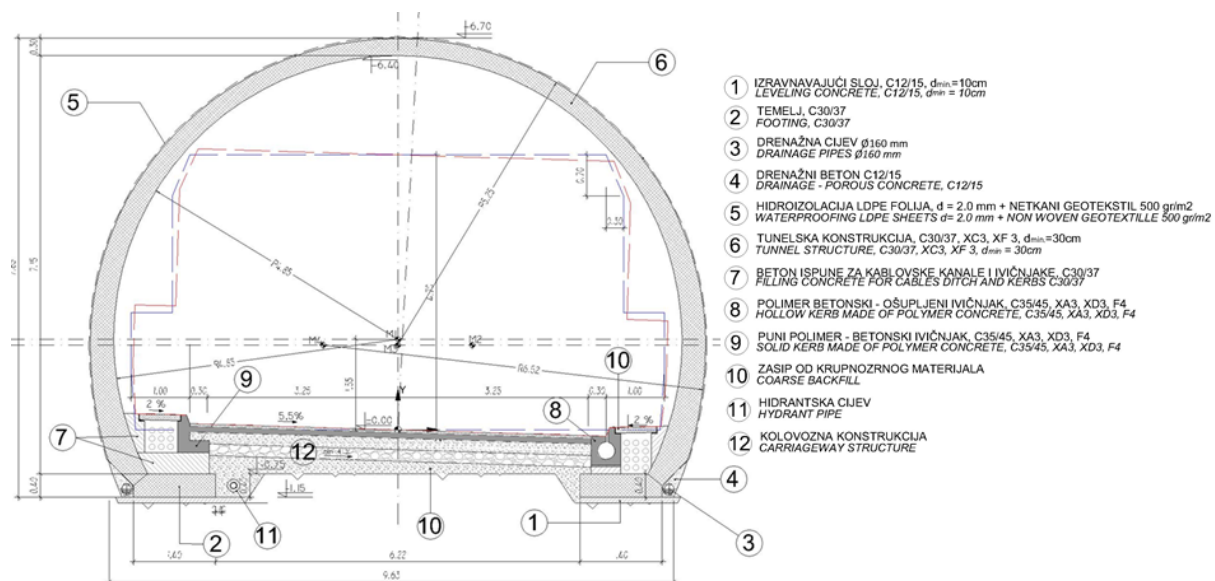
Typical cross-section of the tunnel with the final (secondary) lining
